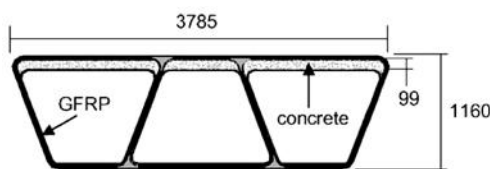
Cross-section of bridge superstructure (Aref et al., 2005)
